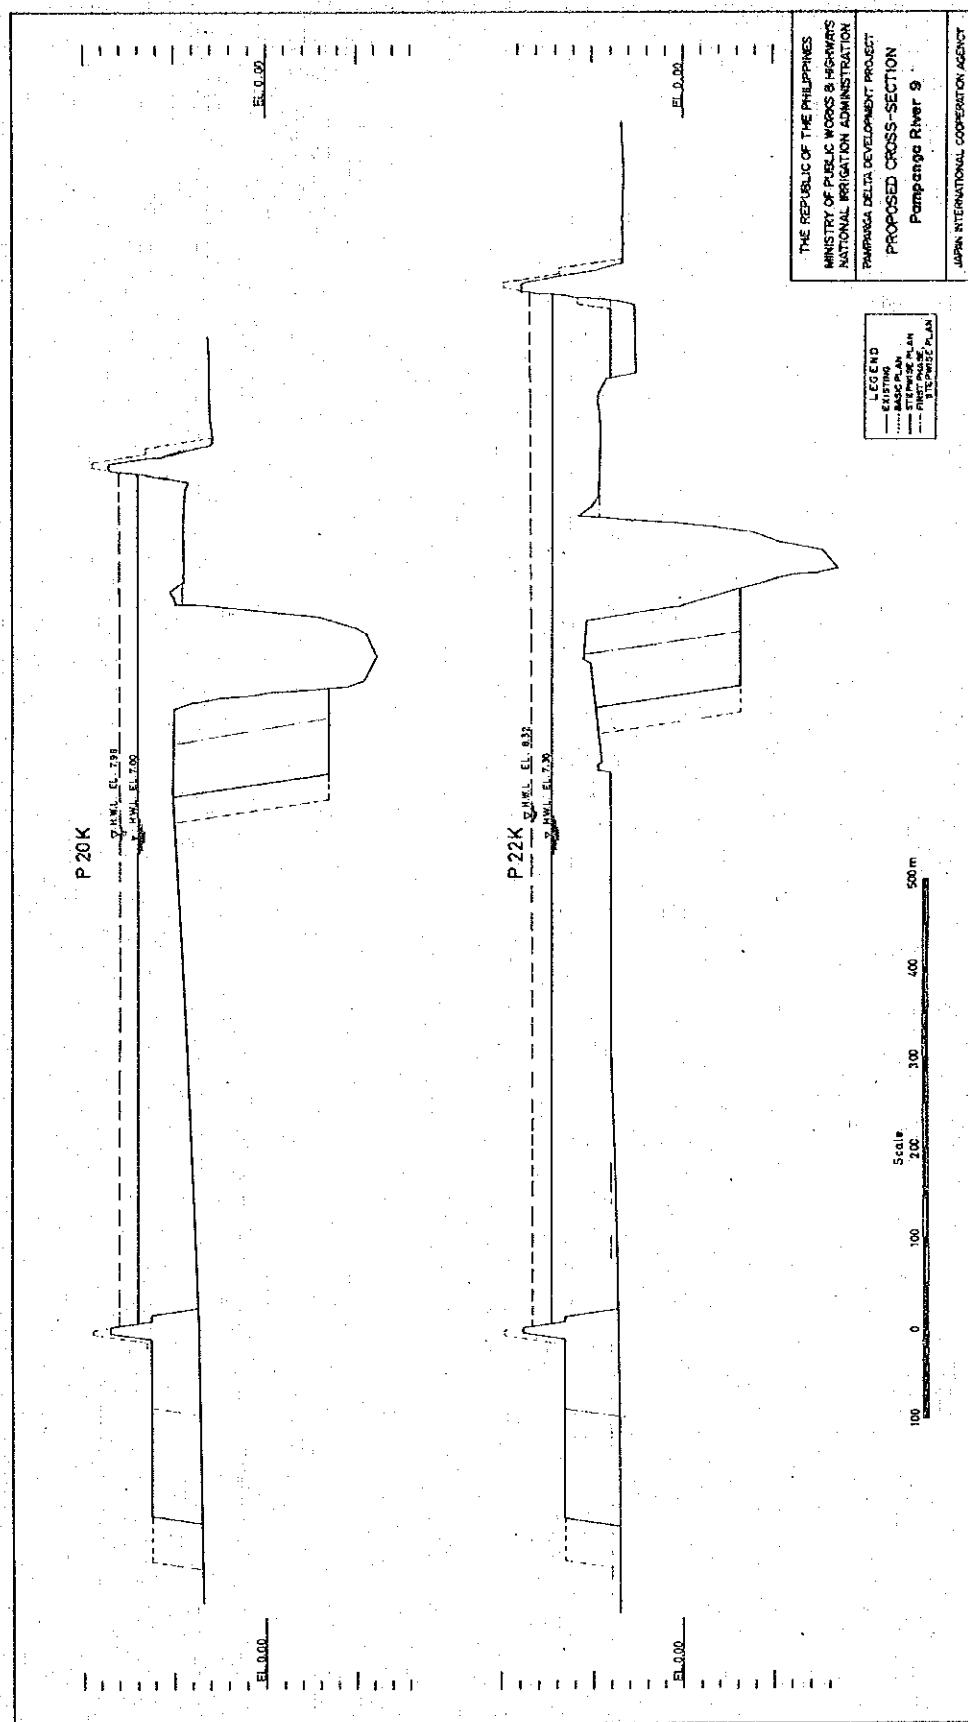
(10) PROPOSED CHANNEL CROSS-SECTION
